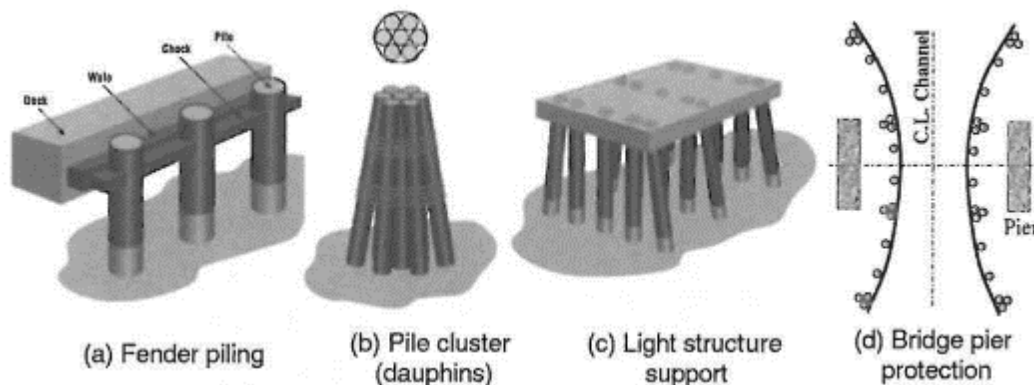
Various piling applications of CFFT: (a) Fender piling; (b) Dauphins; (c) Light structure support pile groups; (d) Bridge pier protection (Fam et al. 2003)
